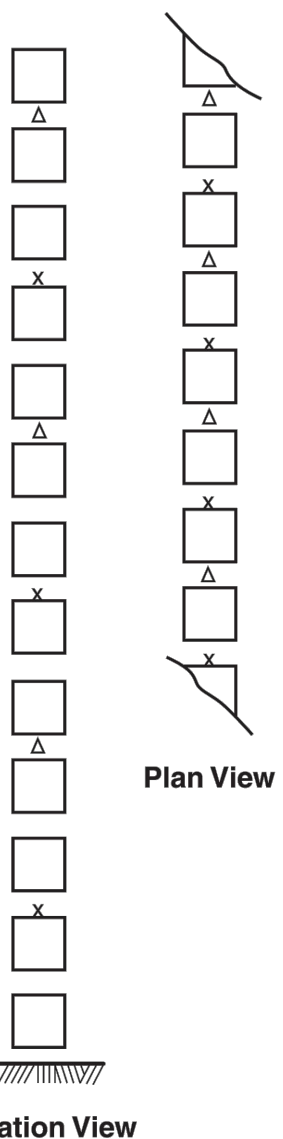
(a) In-Rack Sprinkler Arrangement, Group A Plastic Commodities, Single-Row Racks, Storage Height Over 25 ft (7.6 m) — Option 1.
